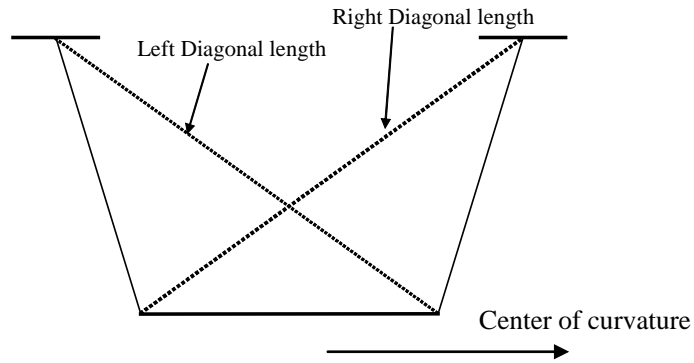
Diagonal lengths of a trapezoidal box girder
